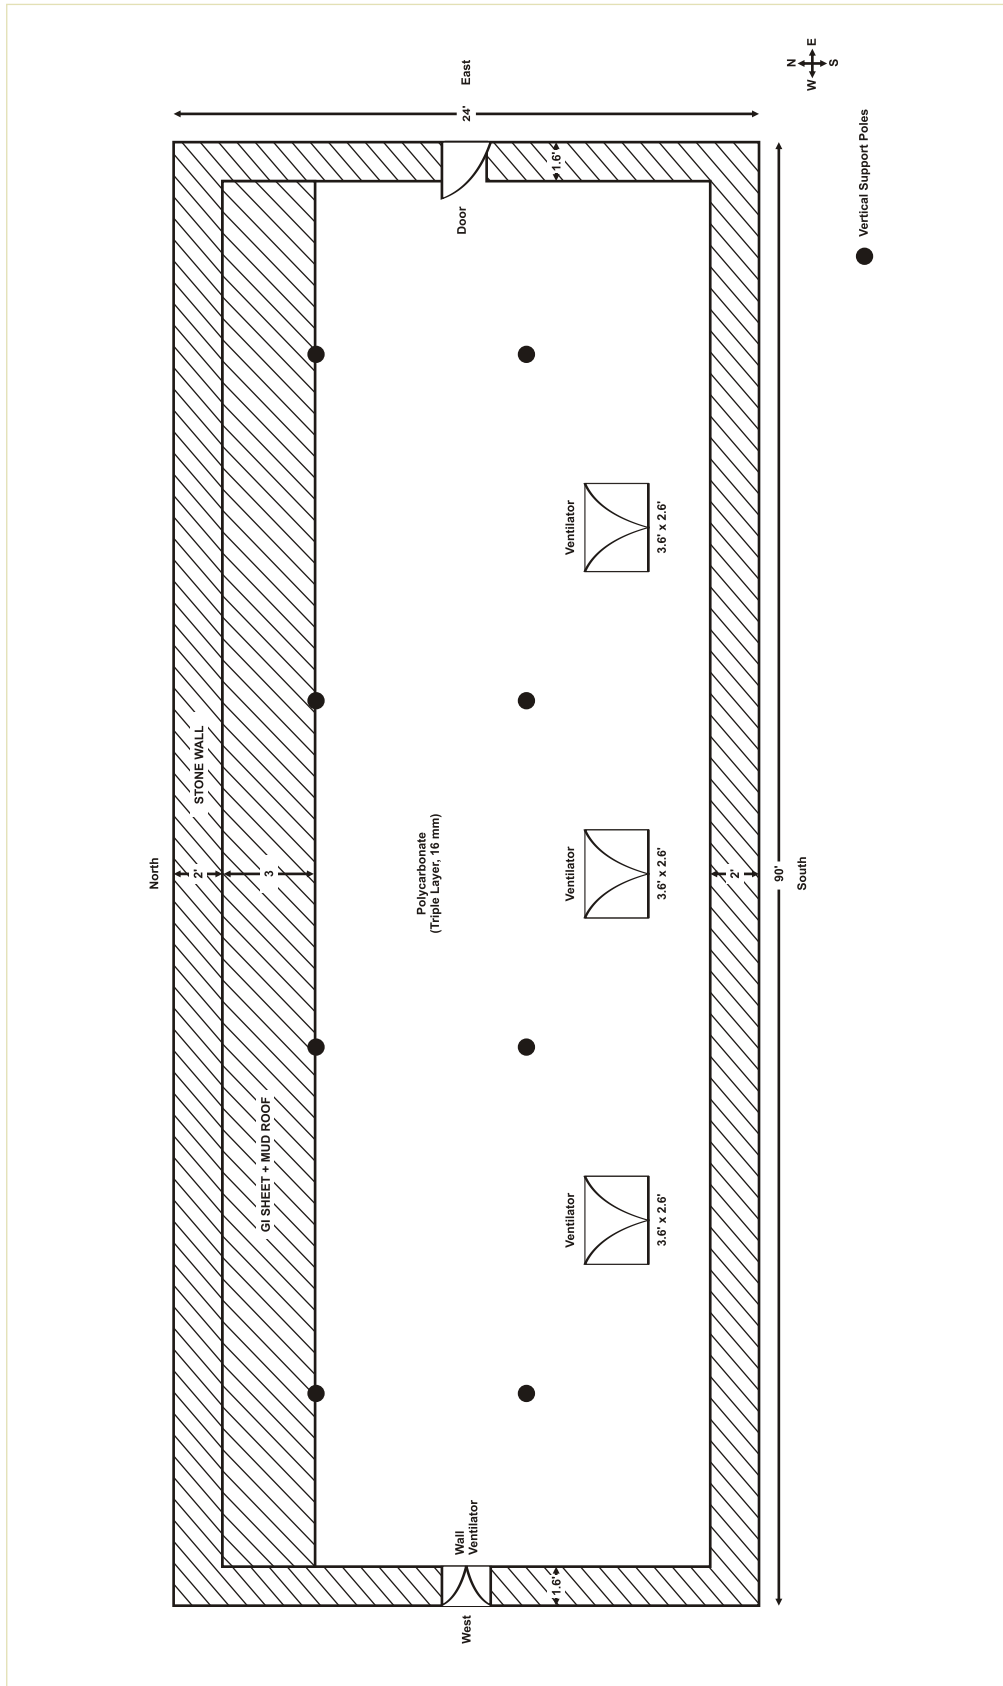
(c): Top view of Medium Type Ladakh Greenhouse (60'×24'; single stone wall)
